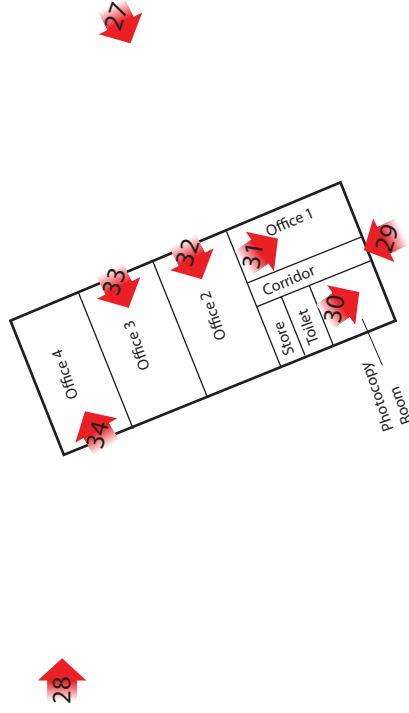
Location and orientation of photographs of building 3 (numbered arrows refer to plate numbers; red lines denote modern wall divisions). Not to scale.
